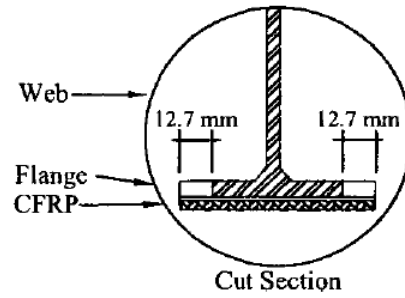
Strengthening of cracked steel-concrete composite girders using CFRP material (Shaath and Fam 2008)
